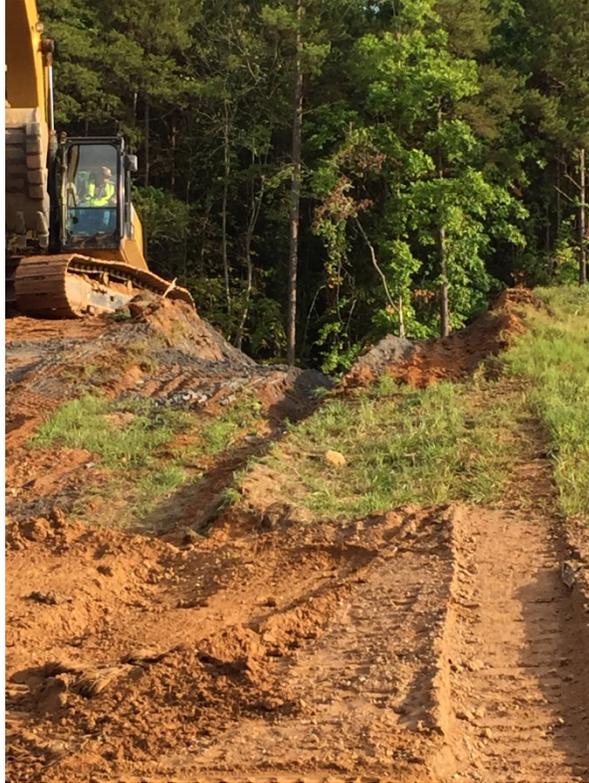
Excavating drainage swale on top of slope looking southwest. Slopes approximately 1-ft of fall every 10'. 8/21/15
